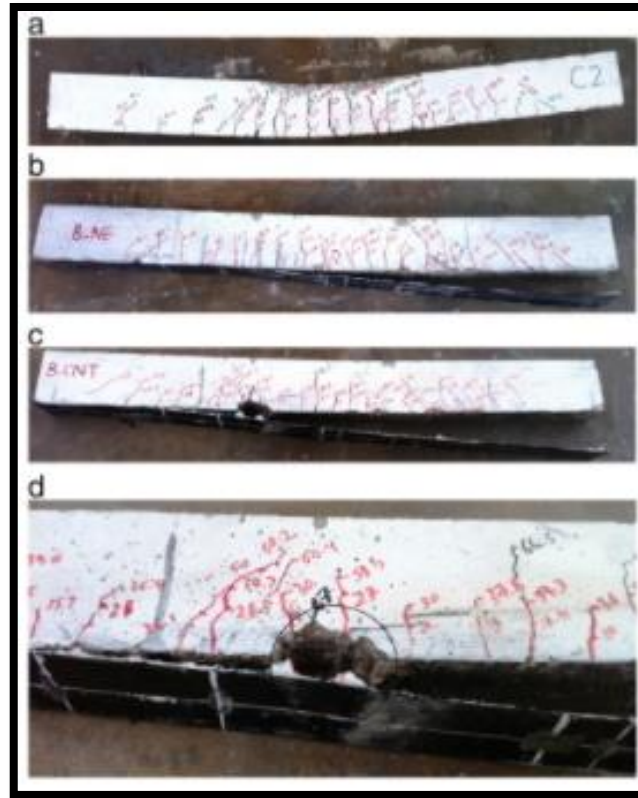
Failure modes of (a) Control specimen, (b) Neat epoxy specimen, and (c) CNTs-modified epoxy specimen, (d) concrete splitting region of CNTs-modified epoxy specimen [97].
